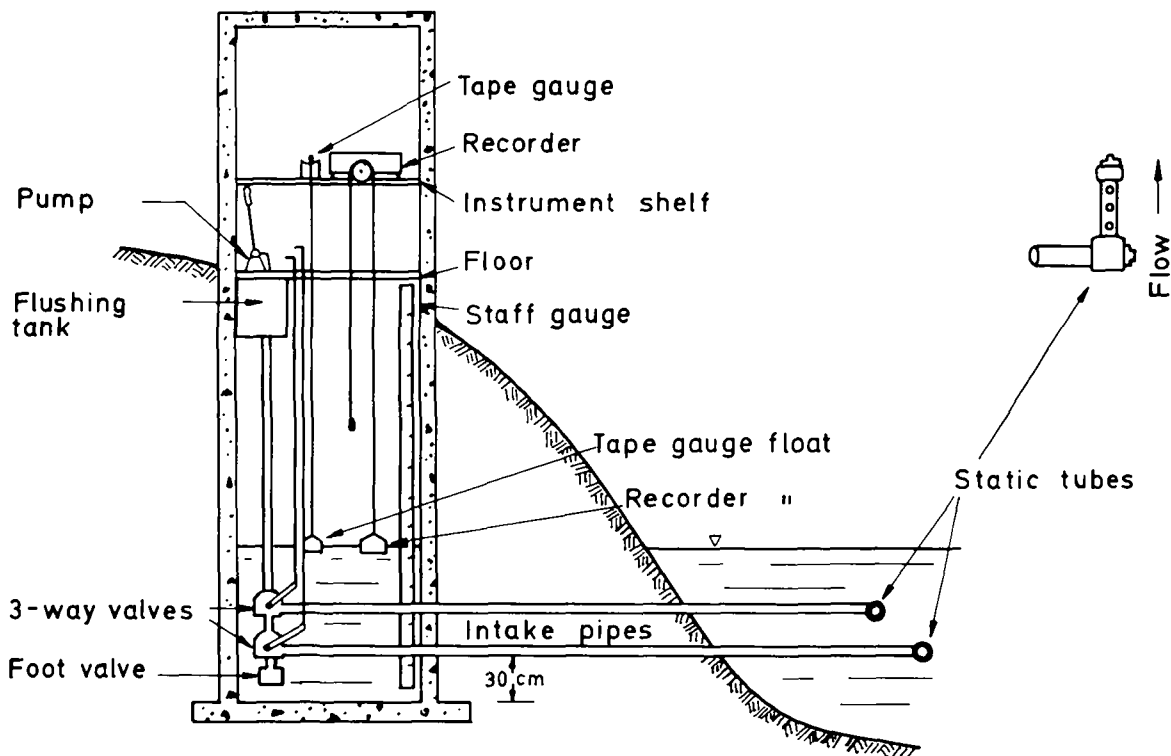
Standard design of Automatic Water Level Recorder; section of house, stilling well and intake.
